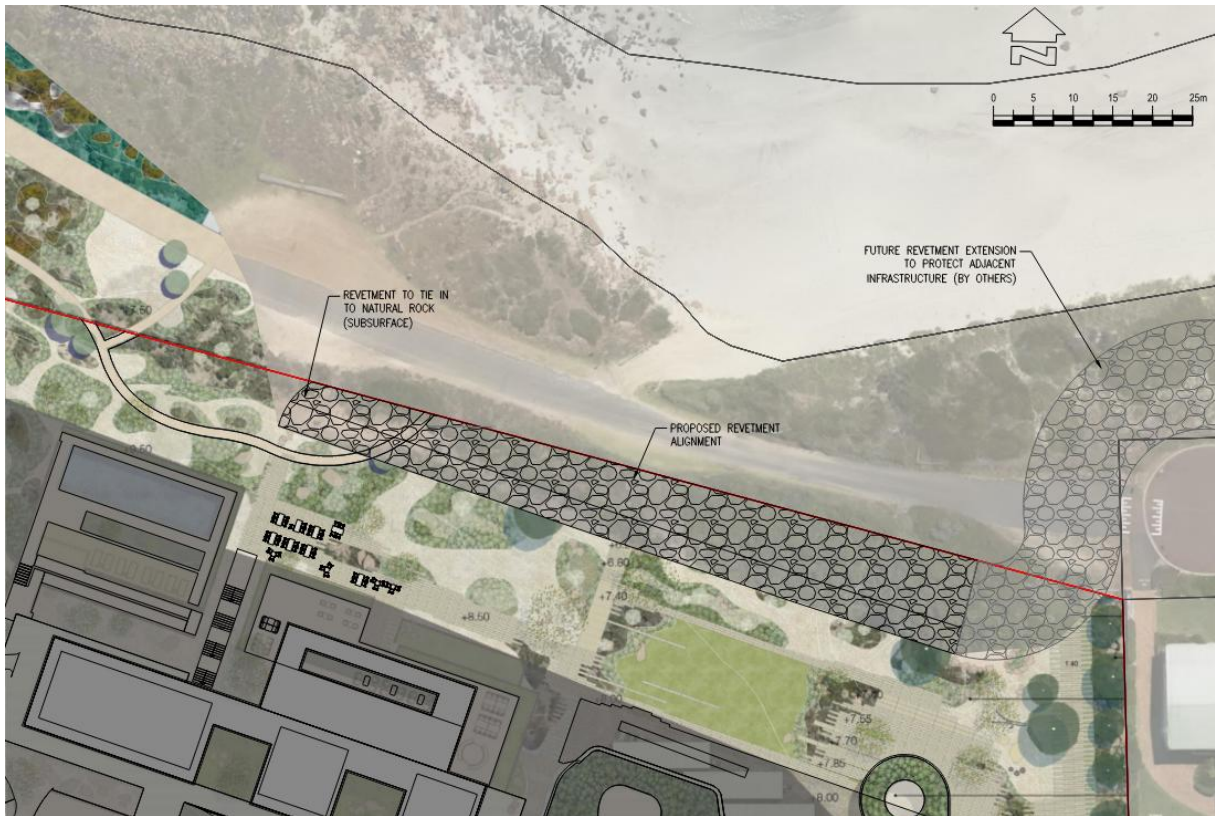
Proposed Alignment for the Construction of the Seawall
